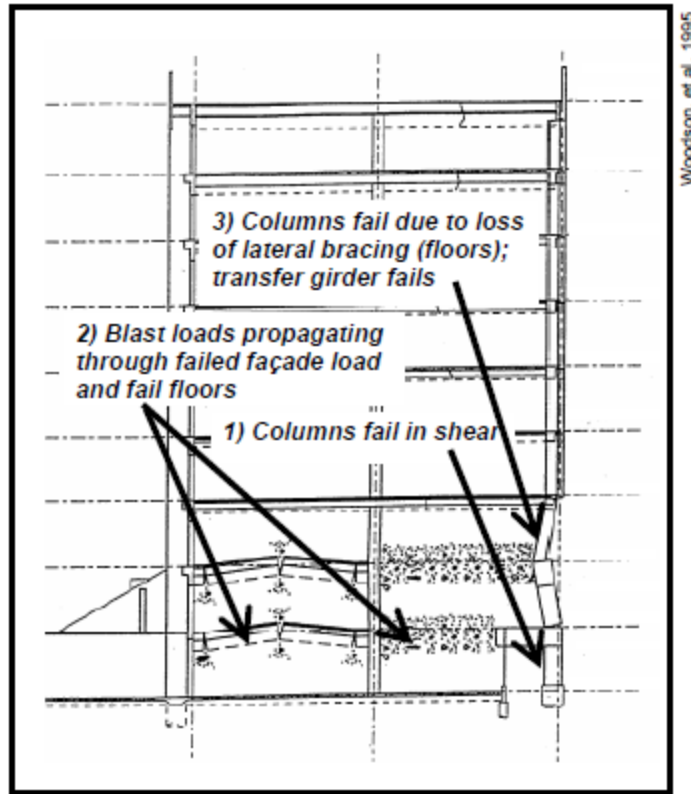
The process of continuous collapse of Murrah building (Marchand, 2004)
